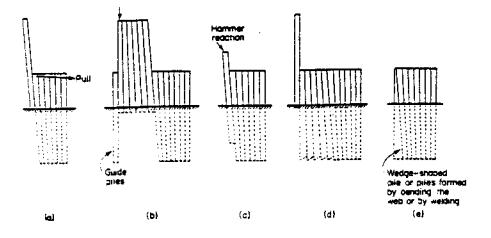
Remedial actions (Teng, 1962, p. 379)
